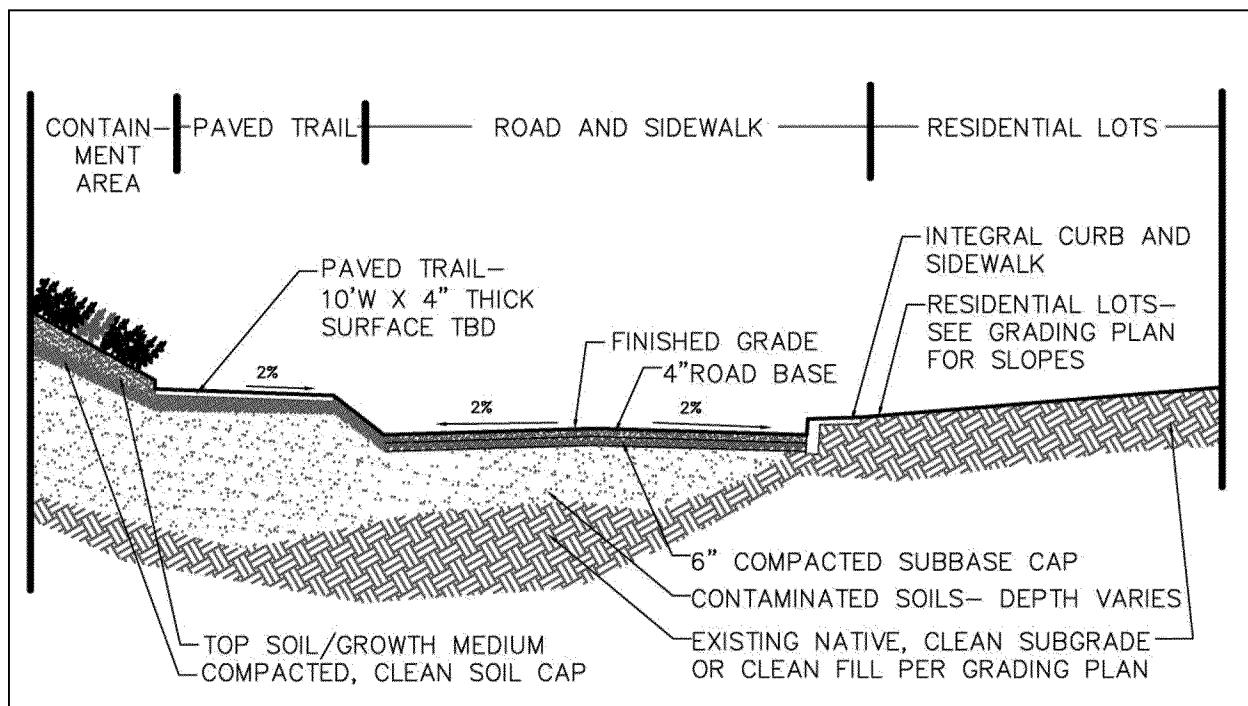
Example Section of Gravel Roadway or Paved Trail Cap
